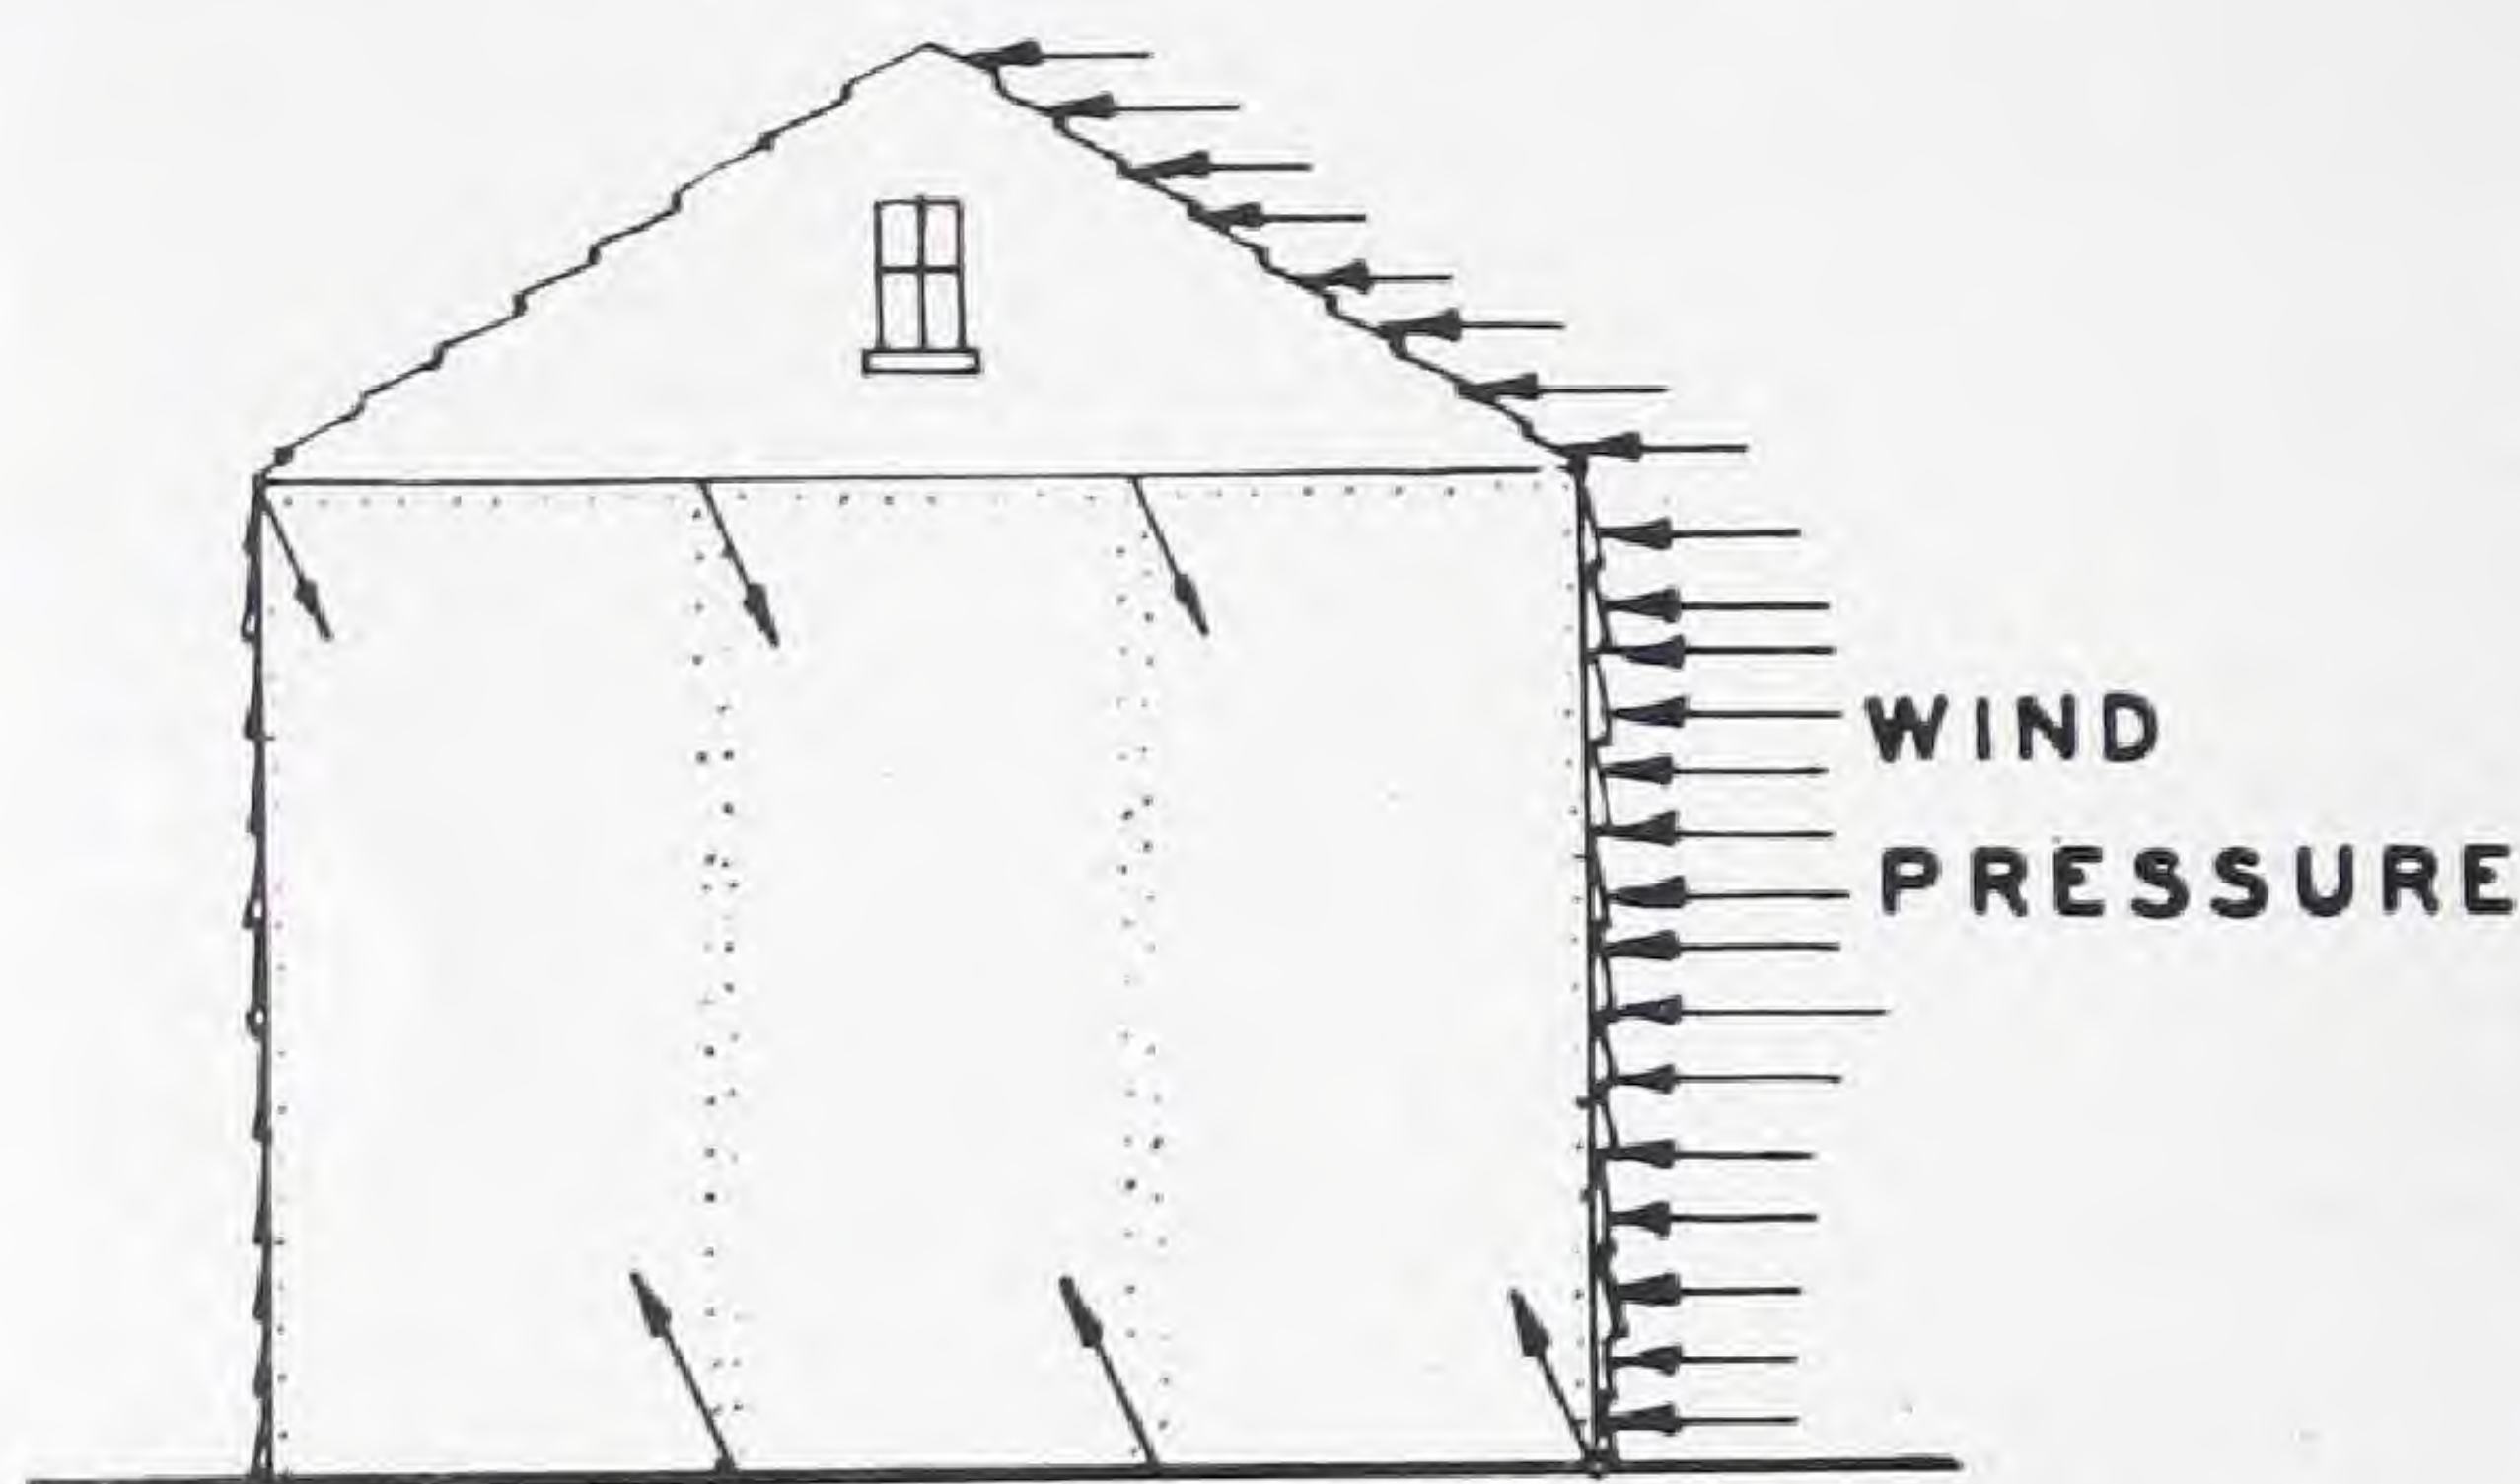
Insulation board sheathing under diagonal tension, same as steel straps in Figure 2; building not distorted.
